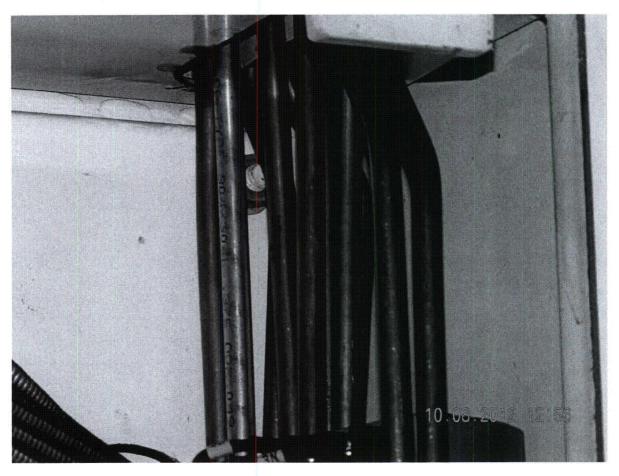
, Mounting Plate Bolt and I&C Tubing Passing Thru Upper Right Corner of Panel
